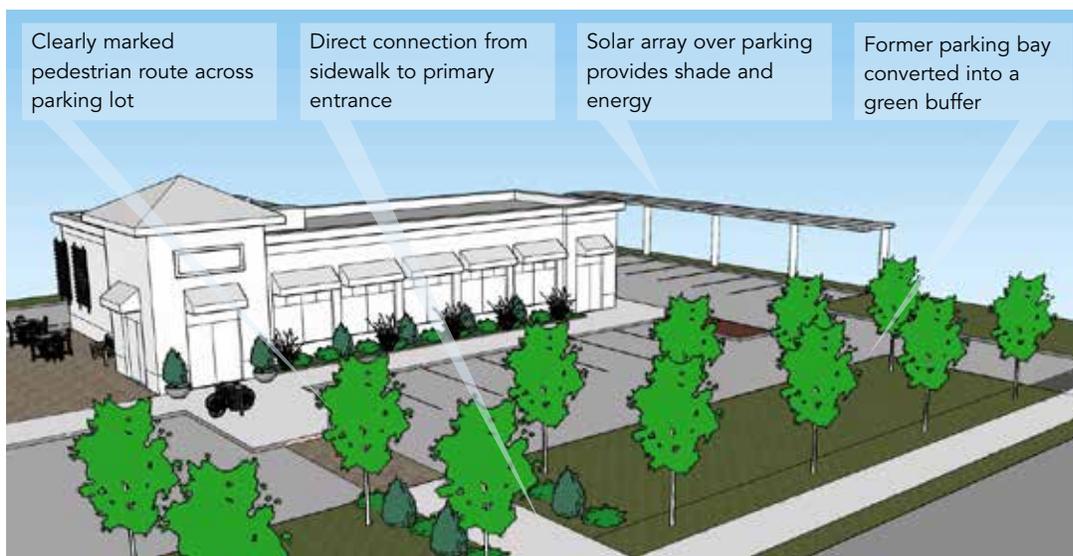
By reducing the front parking lot from two bays to one and providing direct access from the sidewalk across the new landscape buffer to the entrance, this retrofitted retail site has dramatically improved the pedestrian environment.
